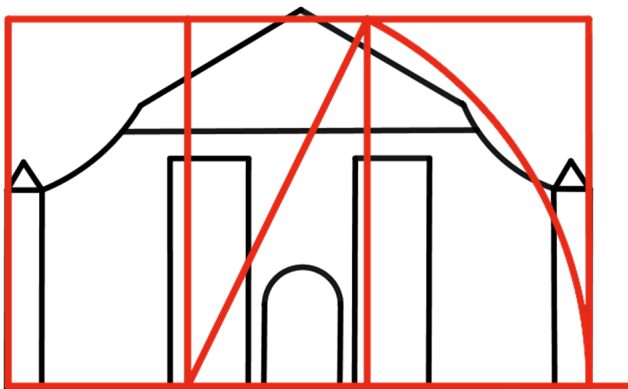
Geometric construction to verify golden rectangle in Jaro Cathedral facade.
